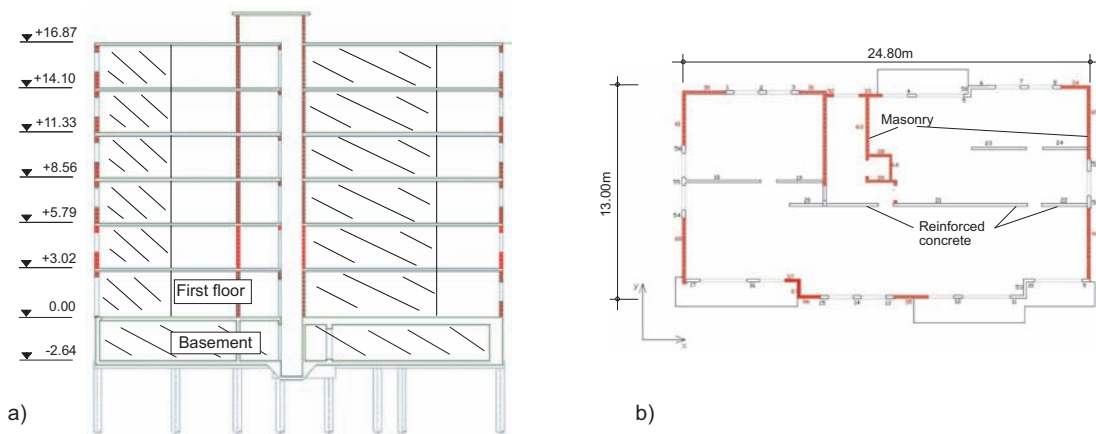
Example for existing shear wall building, a) longitudinal section, b) floor plan.
